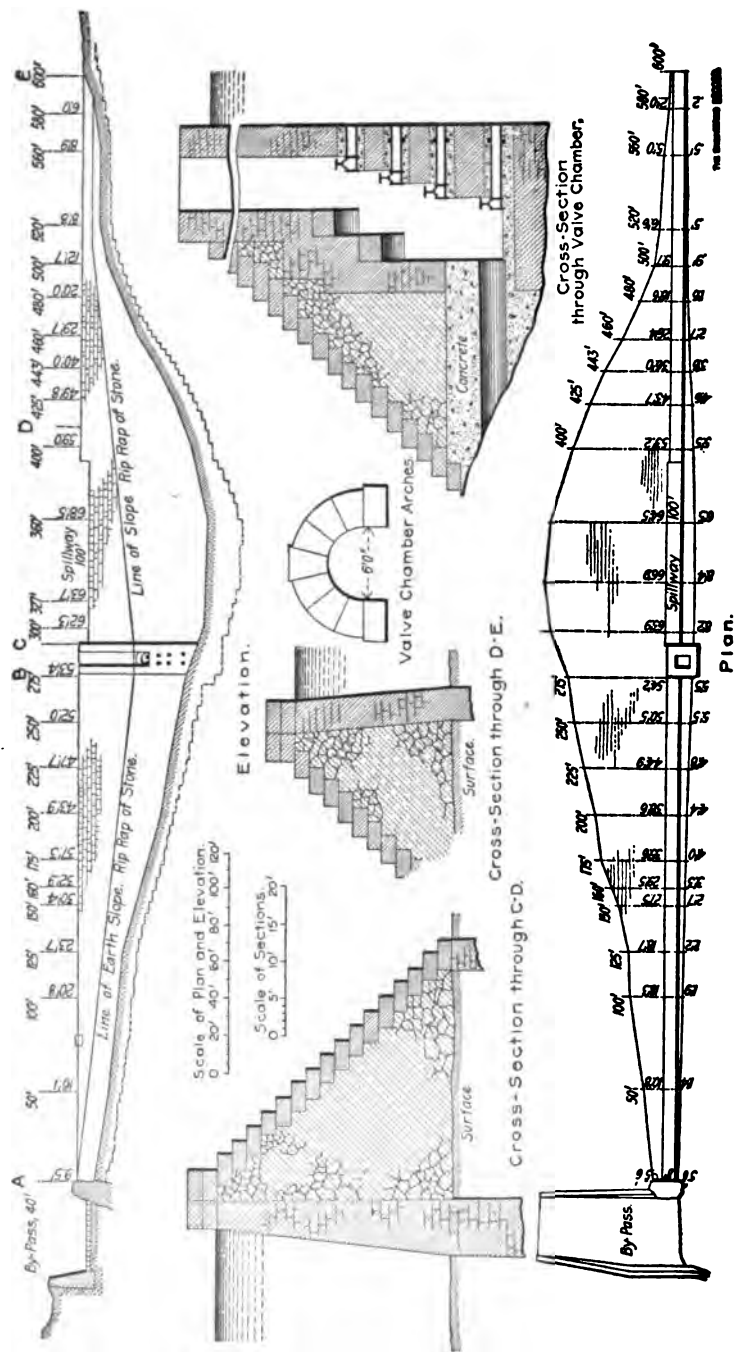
CASTLEWOOD DAM, COLORADO; PLAN, SECTIONS, AND ELEVATION.
